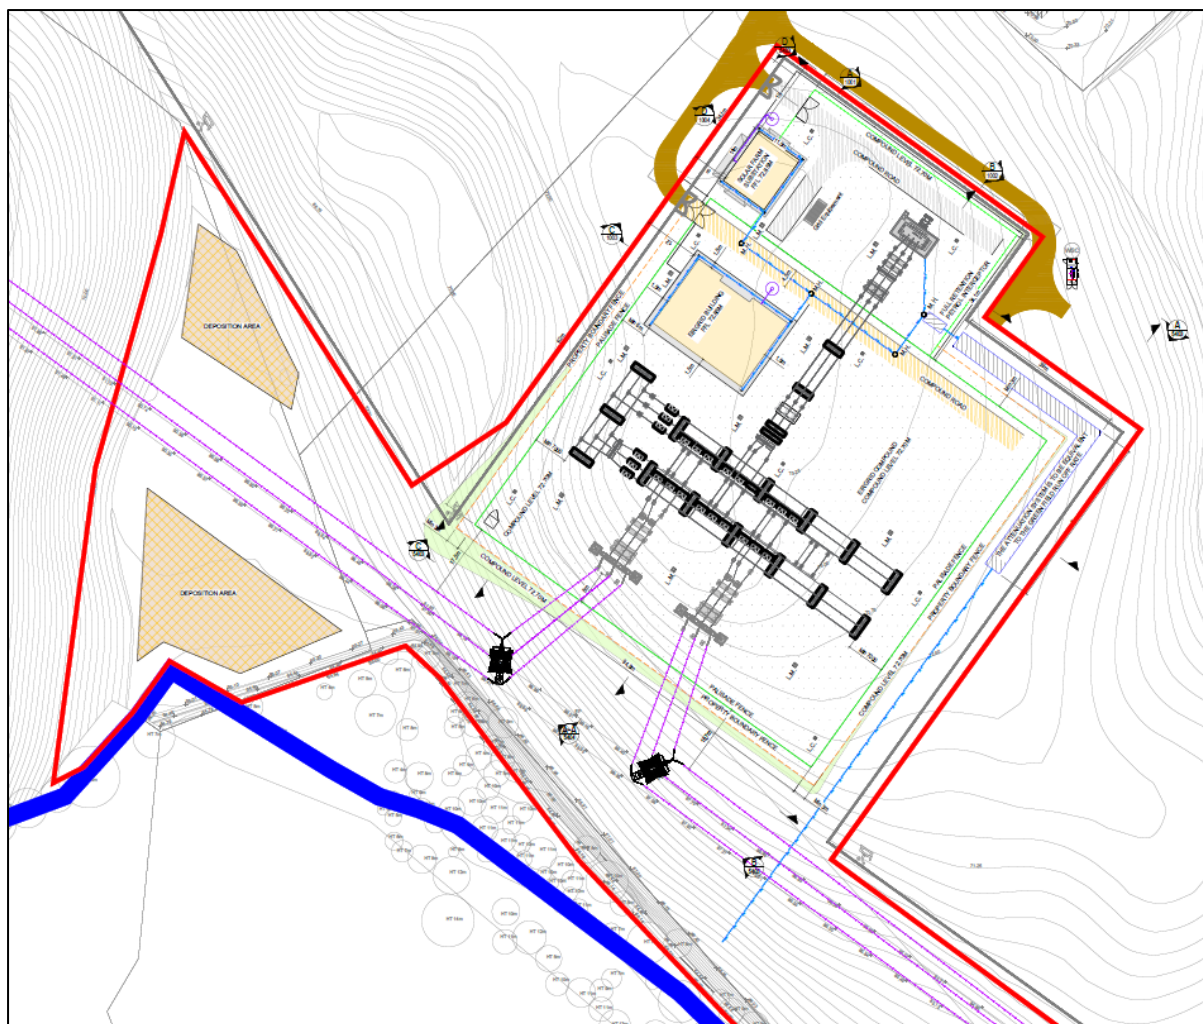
Extract of Proposed Site Layout – Sheet 1 (Source: MWP Drawing No. 23991 MWP 00 00 DR C 5103)
